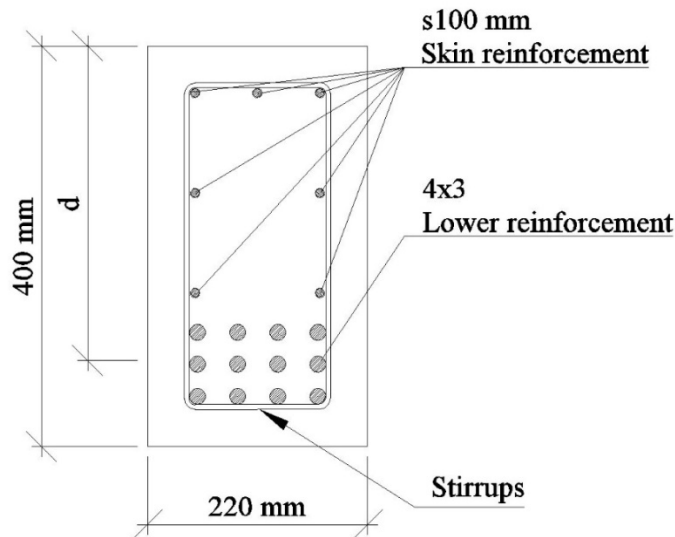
Beam cross-section used in the calculations according to FRC-MCFT.
